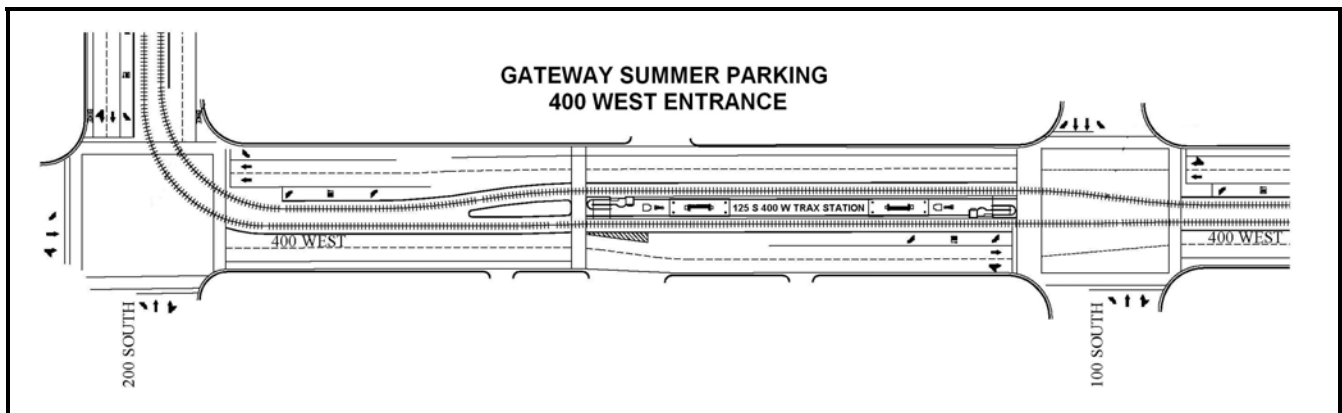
125 South 400 West Station (construct with TRAX Connection)
